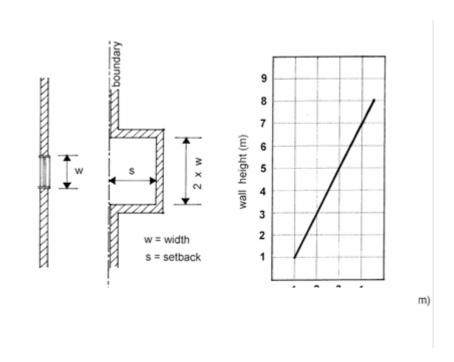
Where 'zero lot line' is proposed (building built to a boundary) then light wells may be required to ensure adequate levels of solar access and ventilation to windows of adjoining buildings
